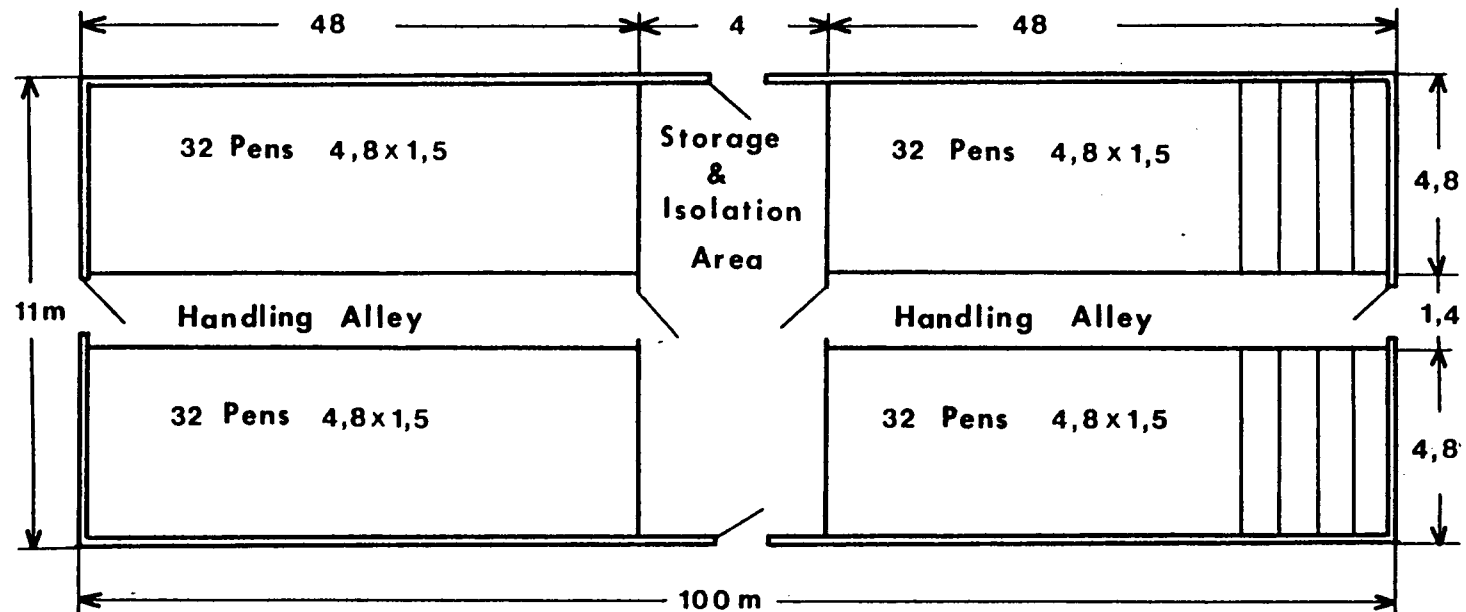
FLOOR PLAN OF THE SWINE FINISHING BARN USED IN CASE STUDY I.
